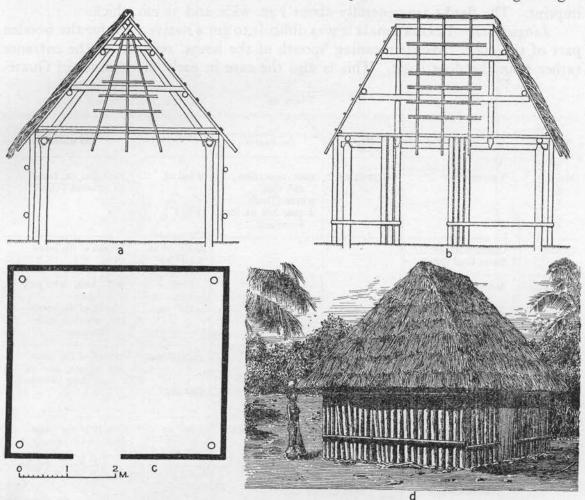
HOUSE 1, SAN SEBASTIAN, GUATEMALA (Rectangular plan, hip roof, short ridgepole, heavy timbers, palm thatch) a,b: Elevations. c: Plan. d: Perspective.
